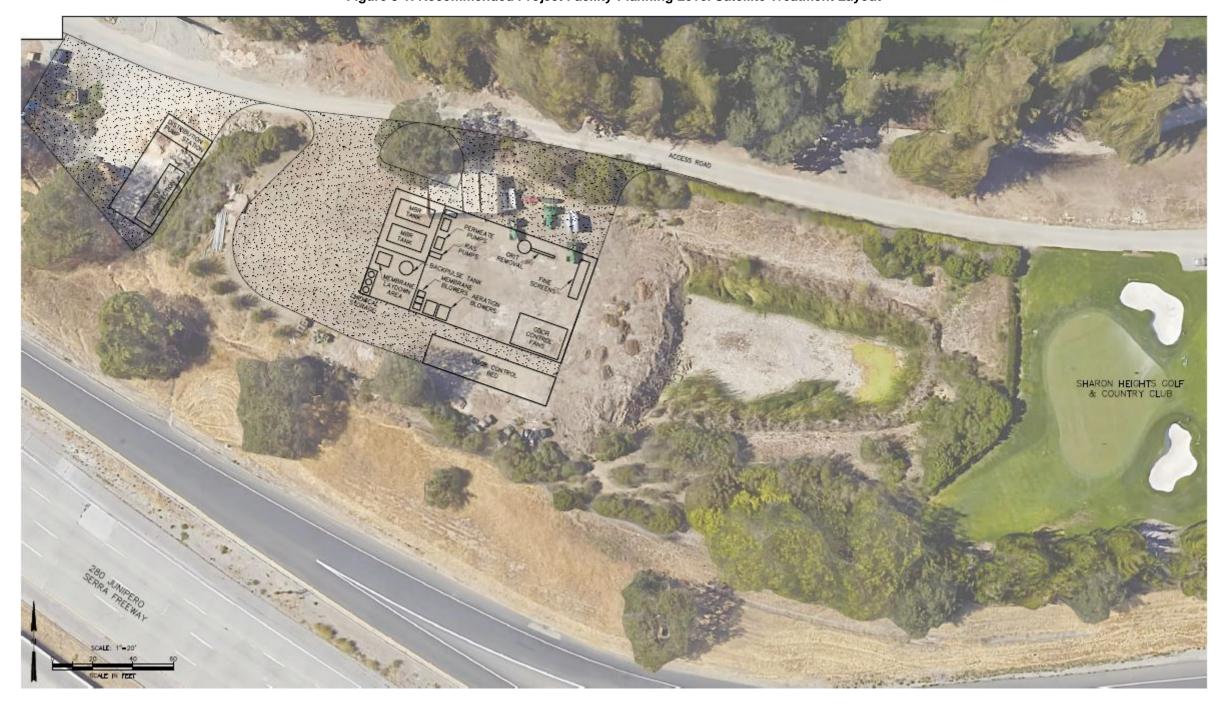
Recommended Project Facility-Planning Level Satellite Treatment Layout
